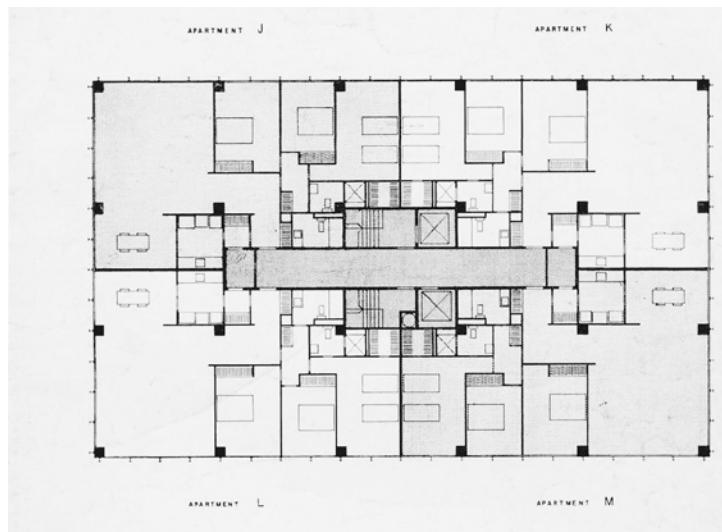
Lake Shore Drive Apartments project – flexible plan, designed by Mies van der Rohe; source: Sales brochure, 860-880 lake shore drive, MoMA, New York.
